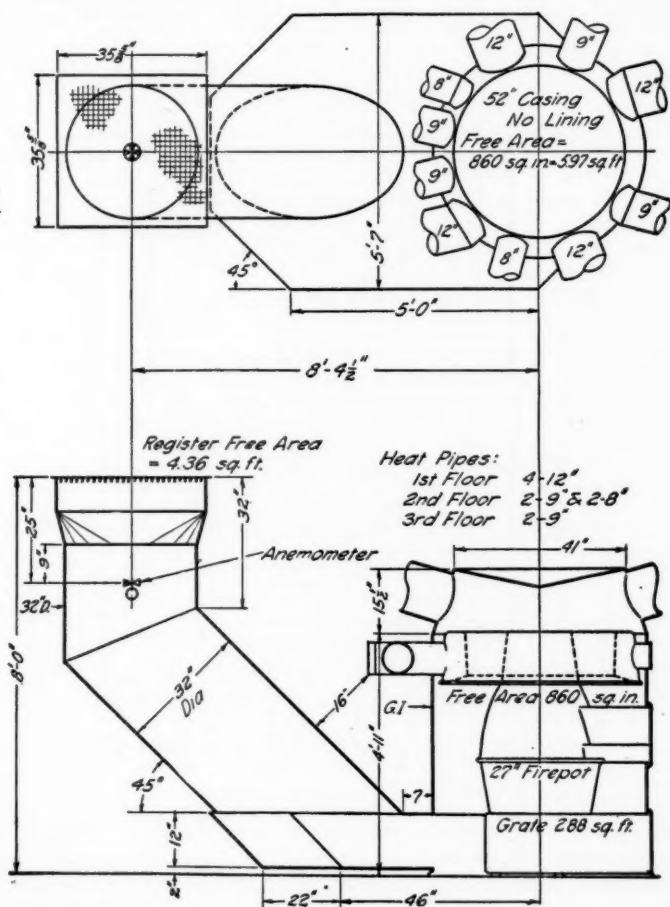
PLAN AND ELEVATION OF THE FURNACE AND RECIRCULATING DUCT
